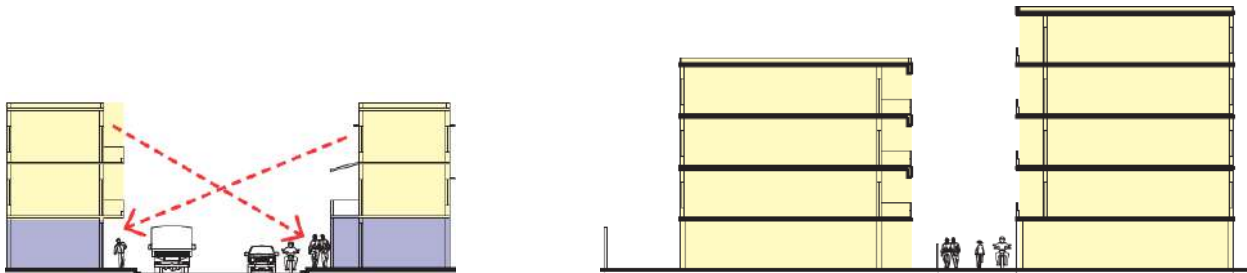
Schematic section showing street interaction & enclosure. Source: Author
